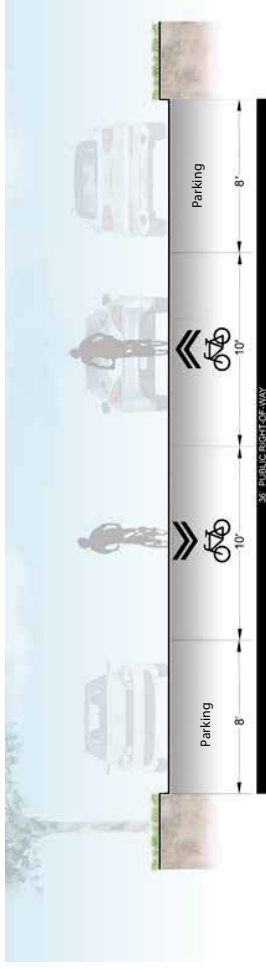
Noble Avenue Bike Boulevard - Alternative Alignment Typical Cross Section
